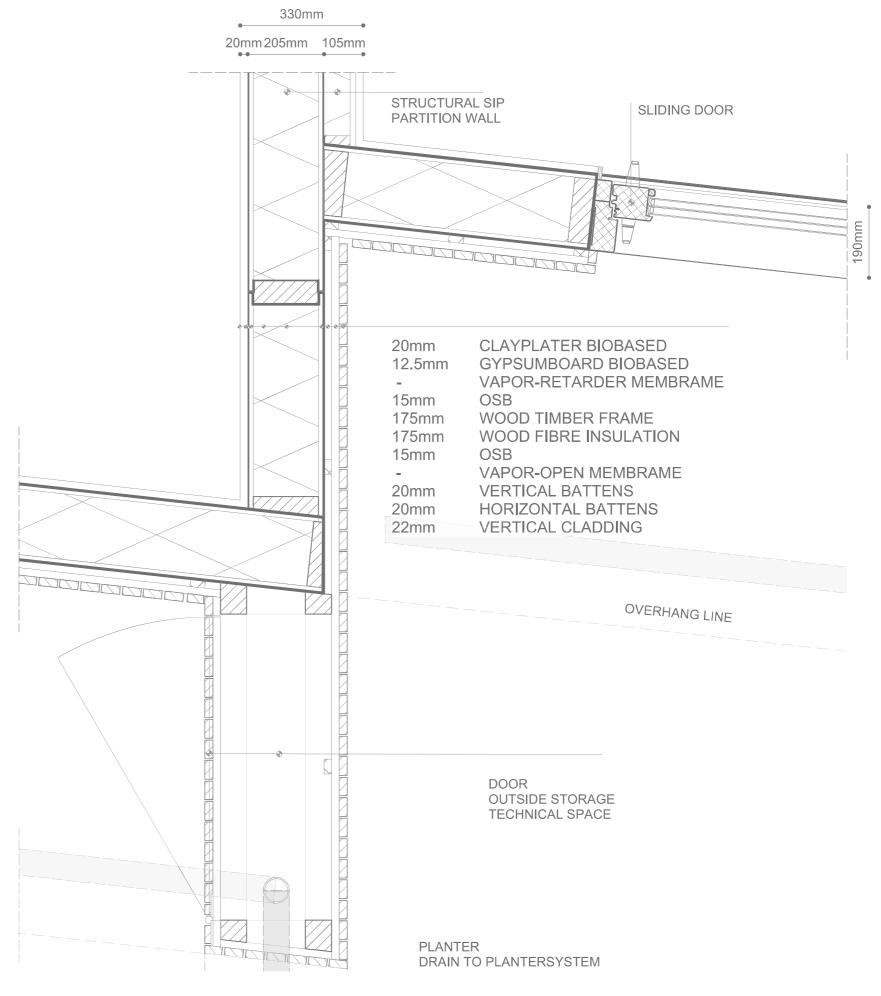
10VERTICAL SECTION GALLERY SIDE
